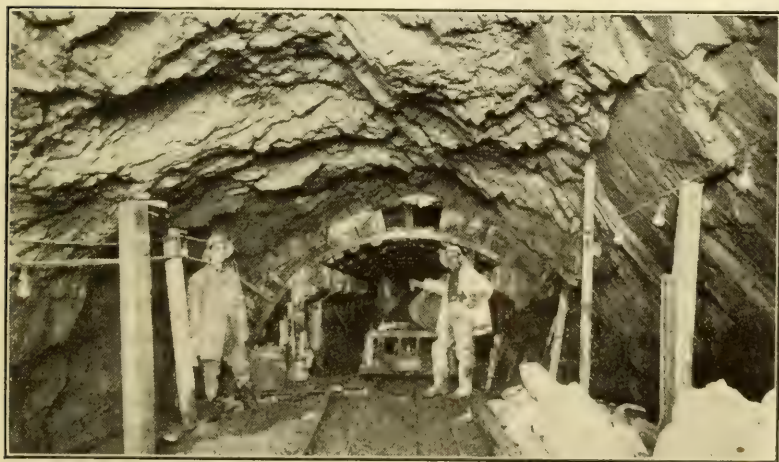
VIEW IN WALLKILL PRESSURE TUNNEL, SHOWING STRUCTURE OF HUDSON RIVER SHALE. CONCRETE ARCH FORMS IN BACKGROUND.
